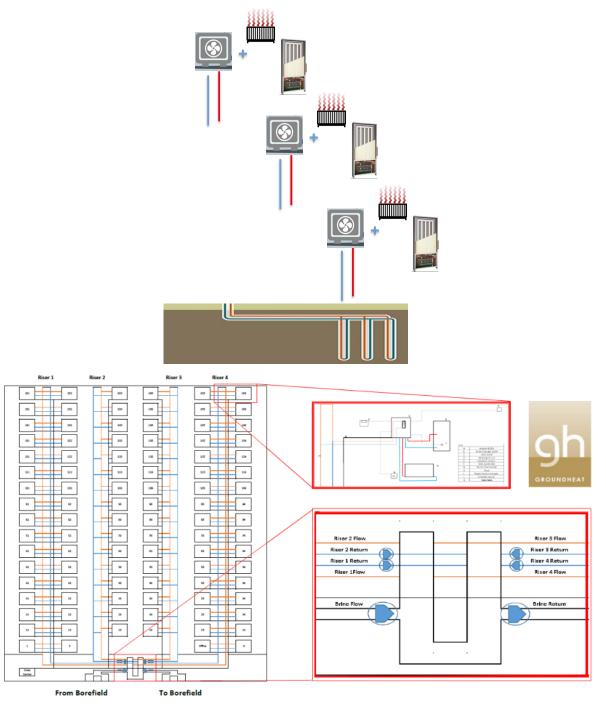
Layout of the system at building level. Schematic of the decentralized heat pumps and bore field (above) and drawings of the risers through the building façade, generation system at dwelling level and detail of the bore field (below).
